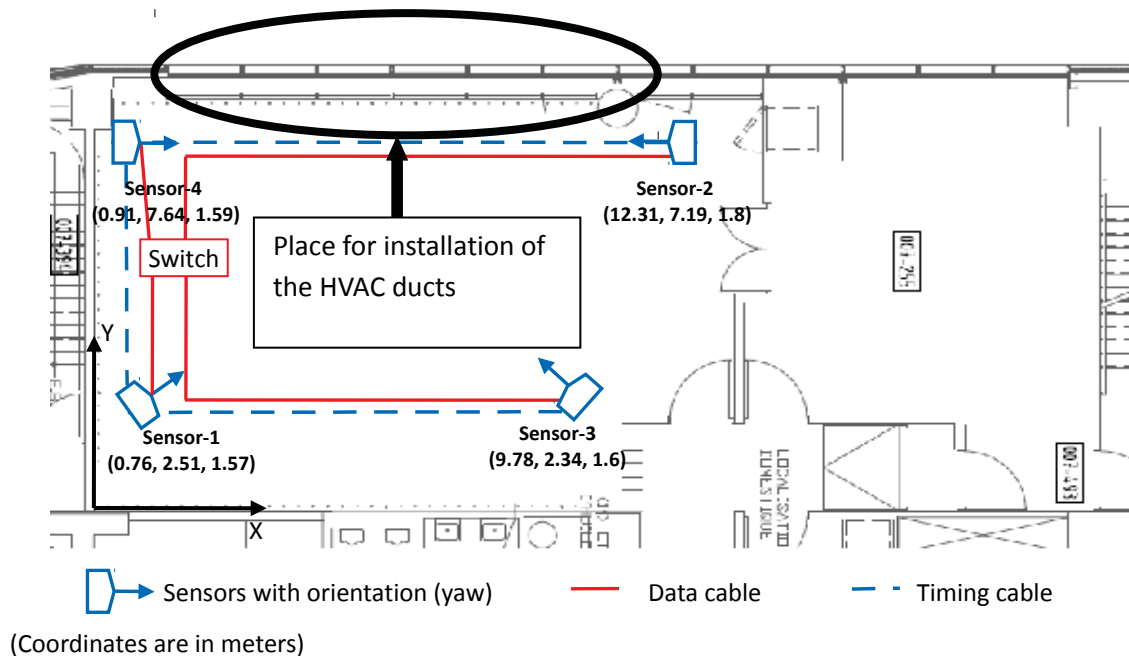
Floor plan of the construction site and the setting of the UWB system
